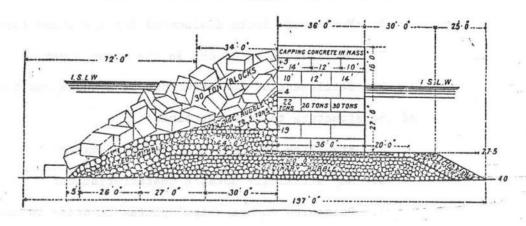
Section of Madras Breakwater as redesigned (1883).
